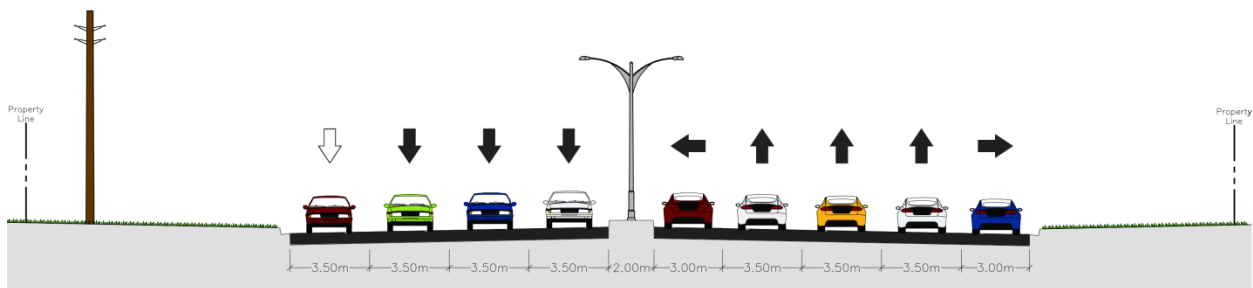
Preferred Design, Highbury Avenue North Cross-Section, South of Hamilton Road
